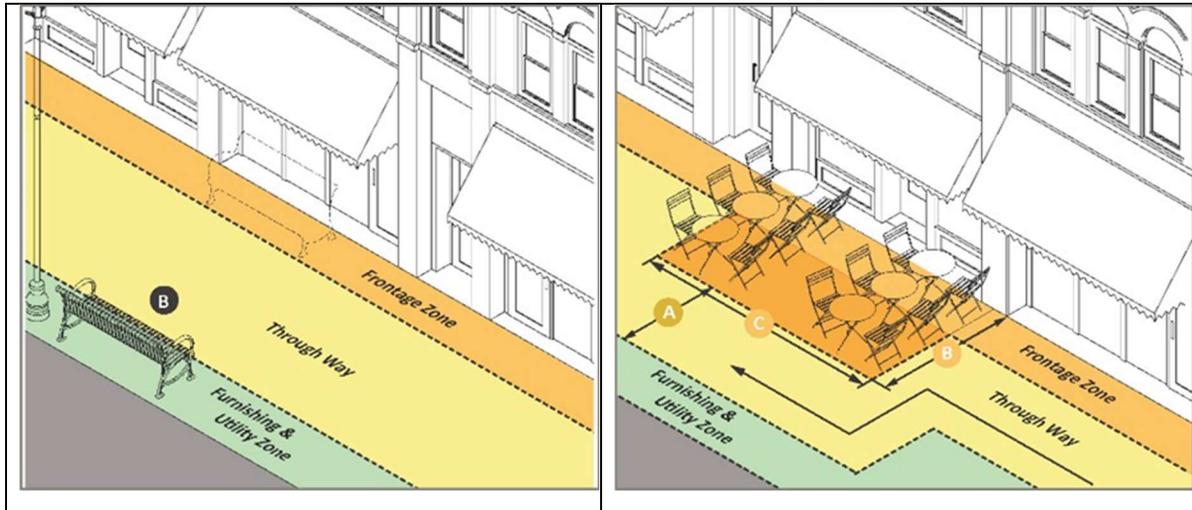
PRIVATE BUILDING FRONTAGE ZONE
